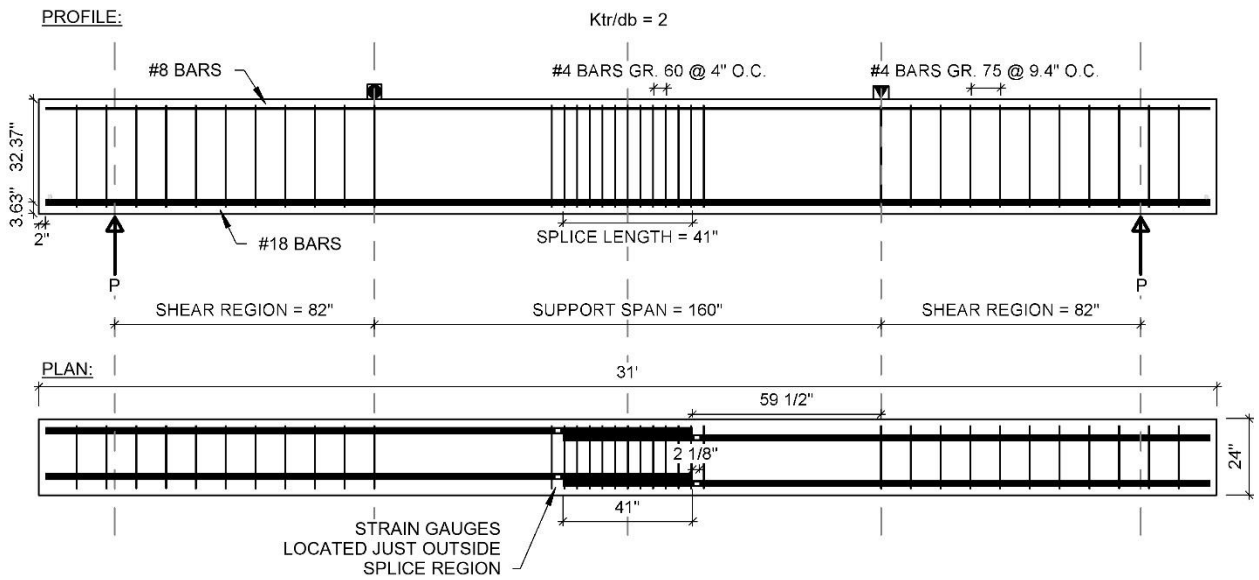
Profile and plan of 18-d (1 in. = 25.4 mm)
